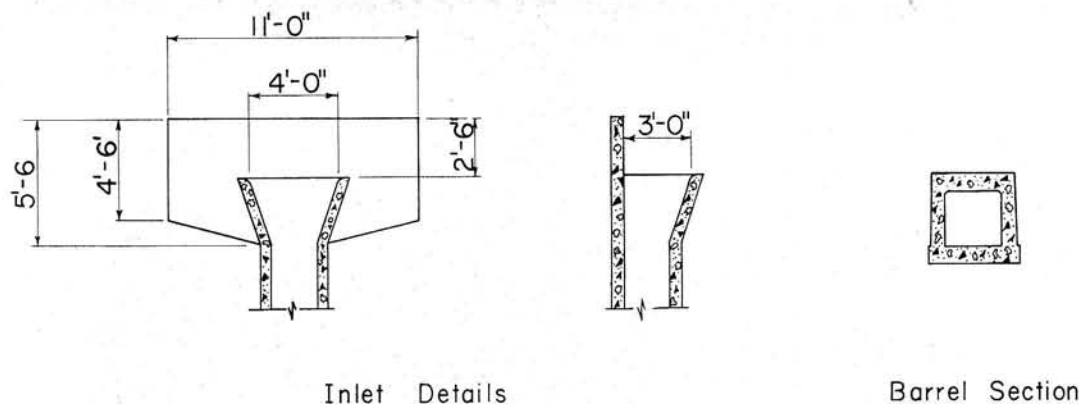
Martha Johnson Closed Conduit Spillway.
